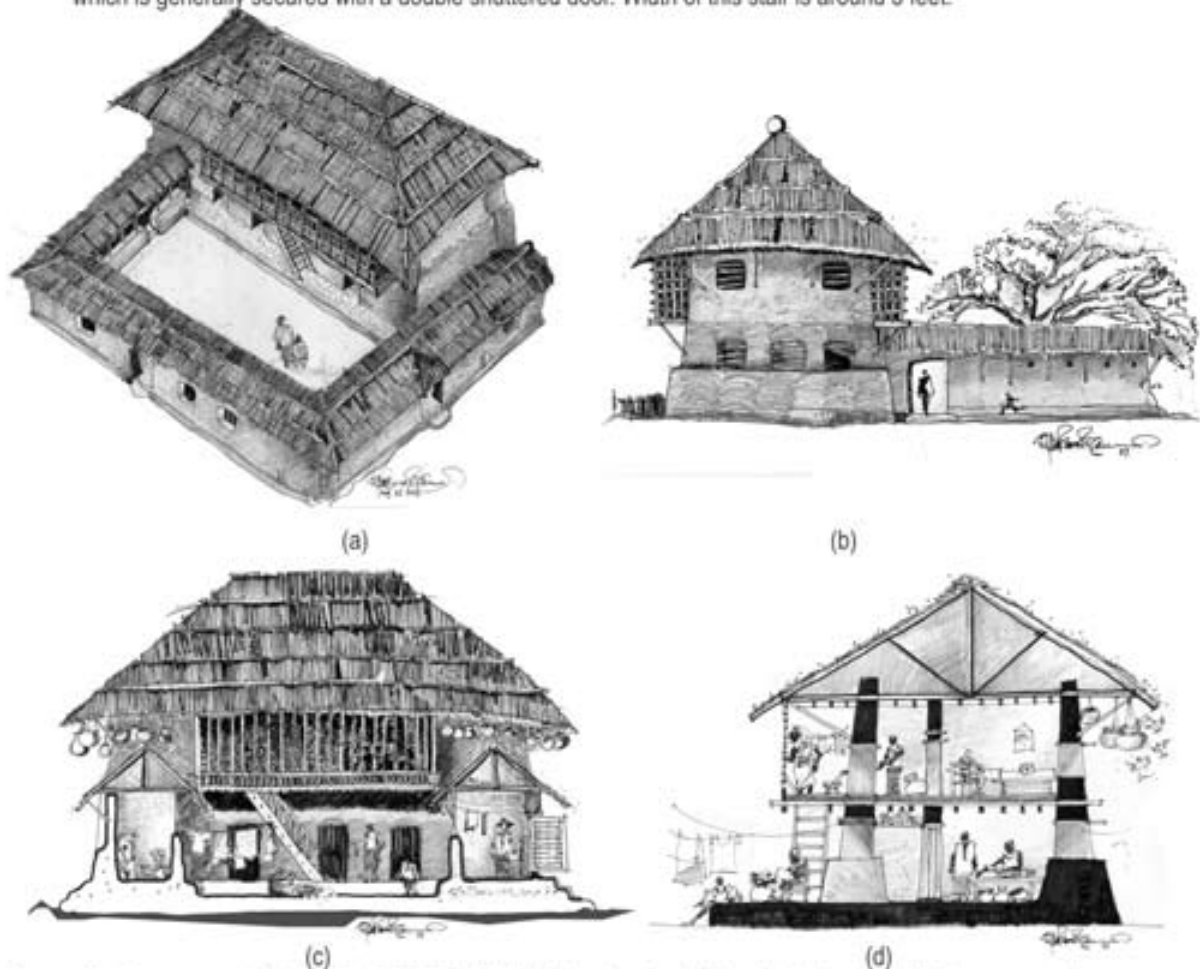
(a) axonometric view of a DO MAHELA, (b) side elevation, (c) longitudinal section & (d) cross section
